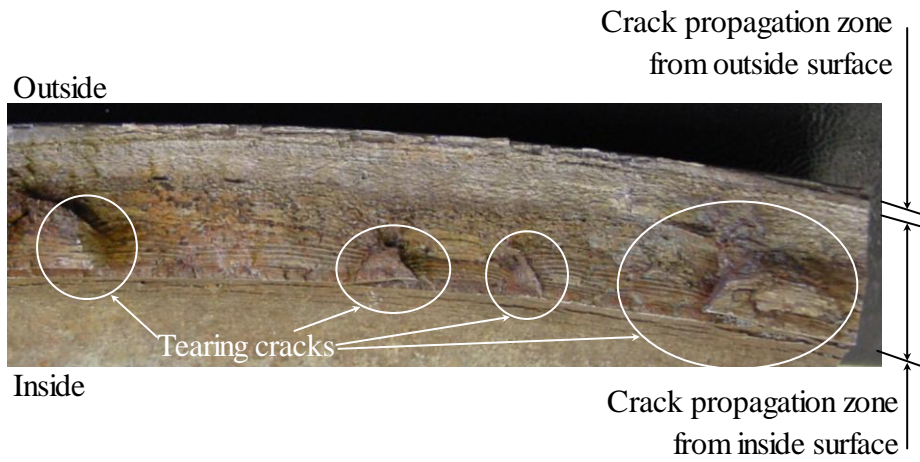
Fracture surface of wrinkle on concave side (specimen LCF16N1)
